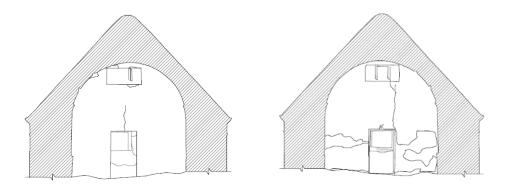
Section AA' looking North (Left), Section AA' looking South (Right) (Source: WCLA)
